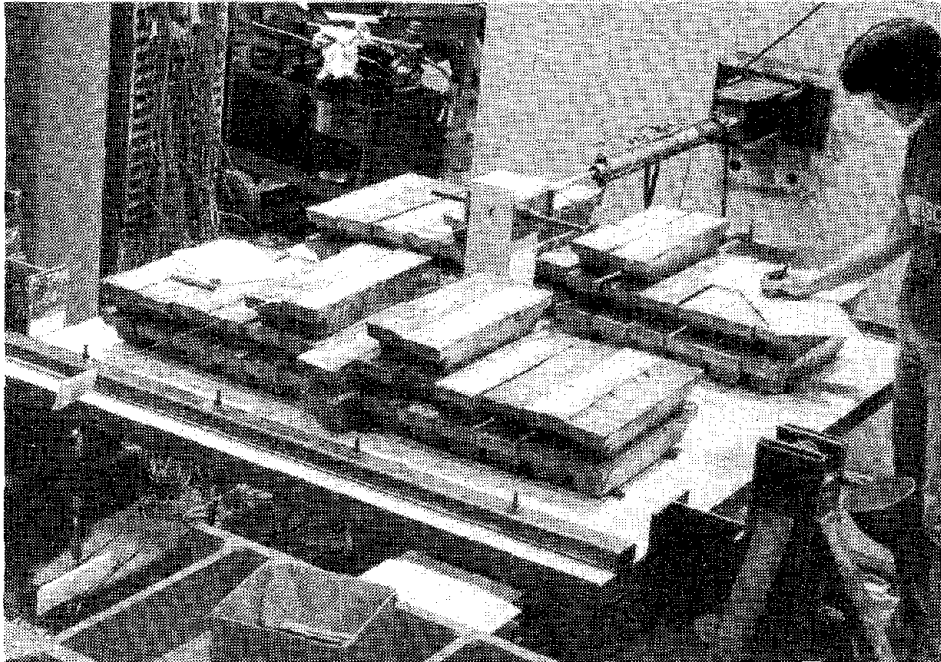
Typical Pin-Ended Link Bolted To Slab And Floor
